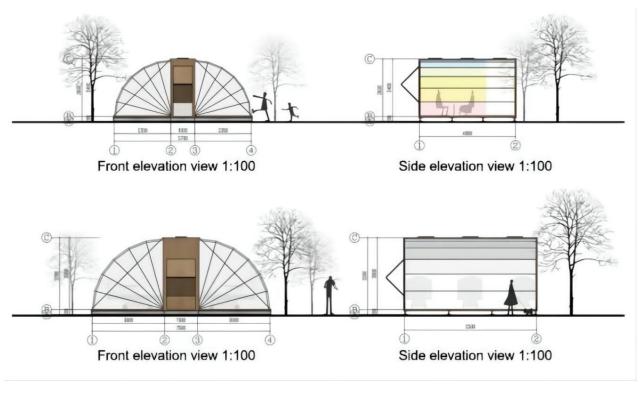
Dimensional drawings of two scale buildings Source: APSEC
